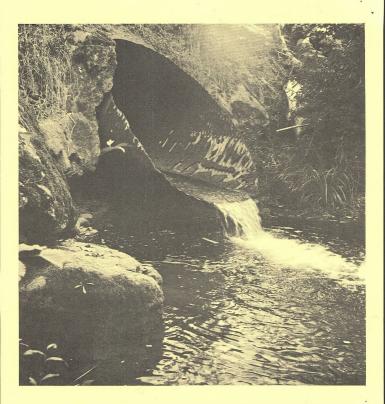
GOLD CREEK - Culvert outlet before dams were built. Overhang prevented passage of salmon and steelhead.
